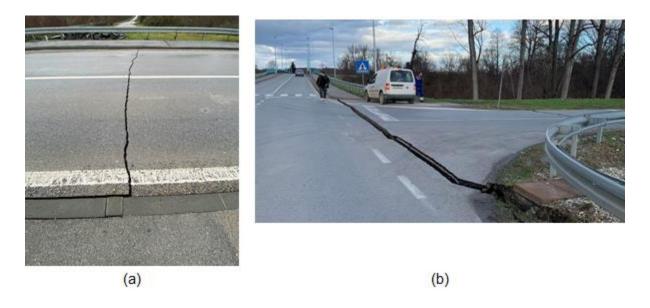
(a) A wide transverse crack at the Brest Bridge approach road (source: Mate Baričević) and (b) a wide fissure in the road close to Brest Bridge (source: Index.hr 2020d).
